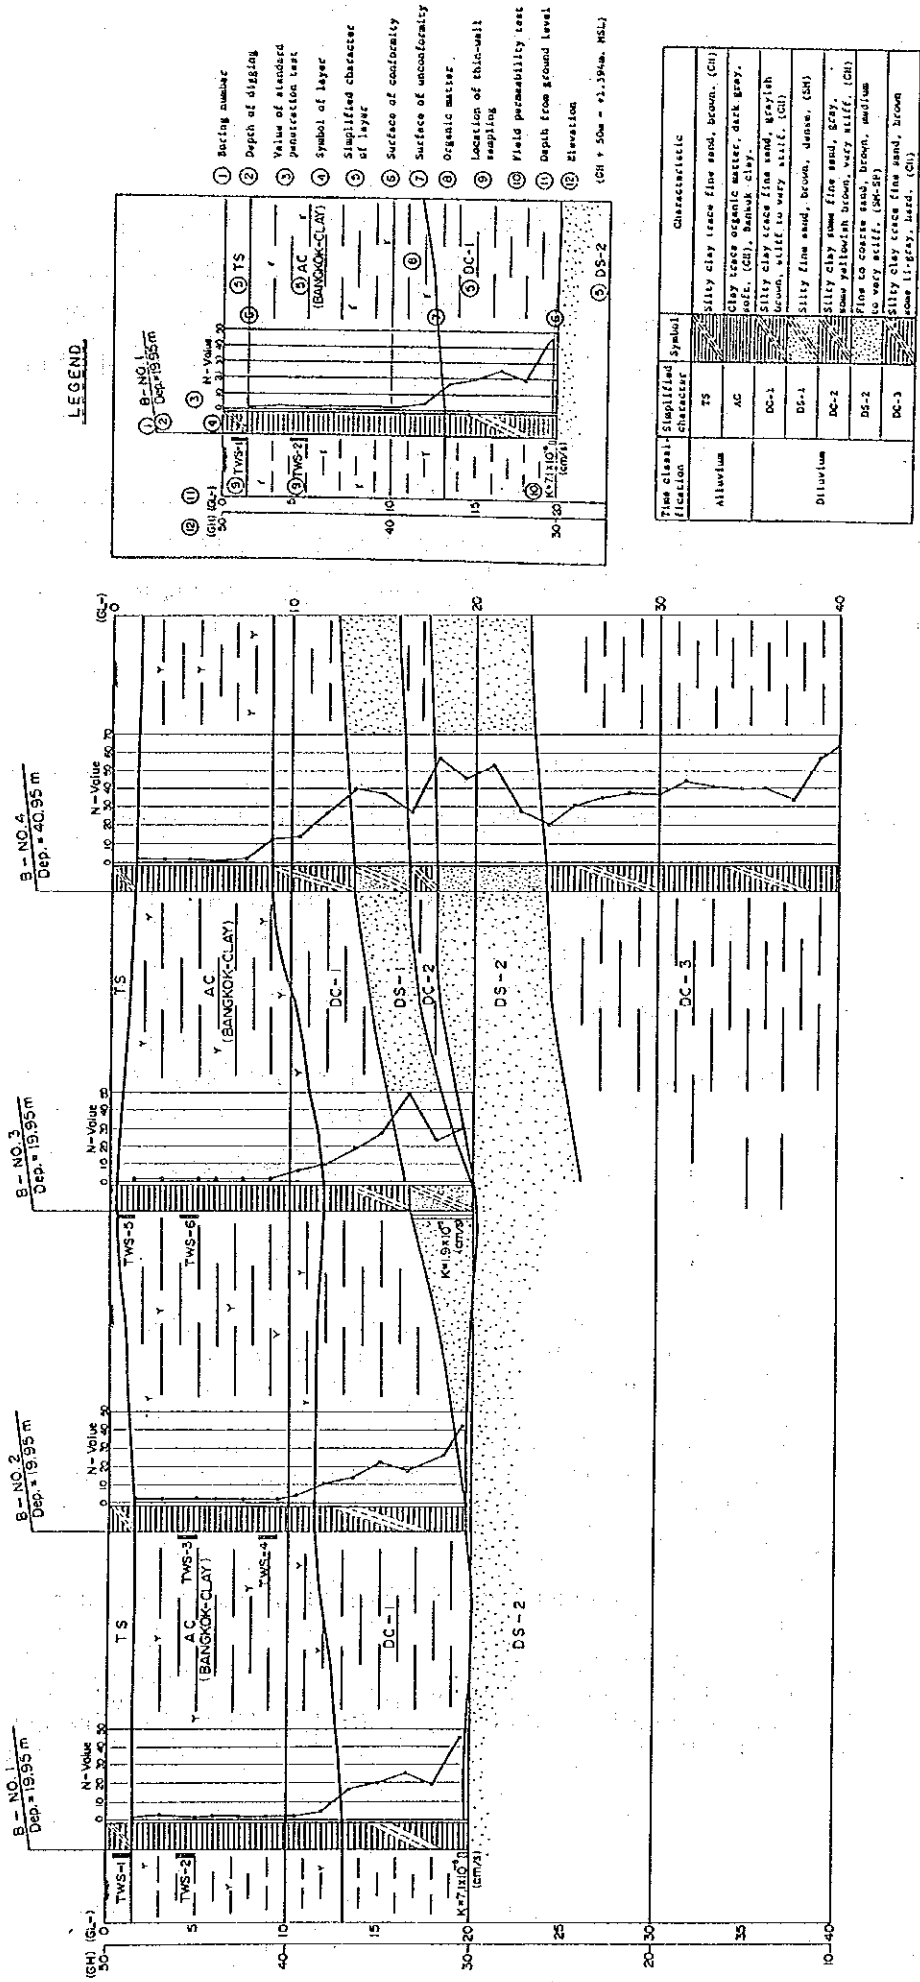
Geological Logs and Cross Section of the Planned Ram Intra Site
